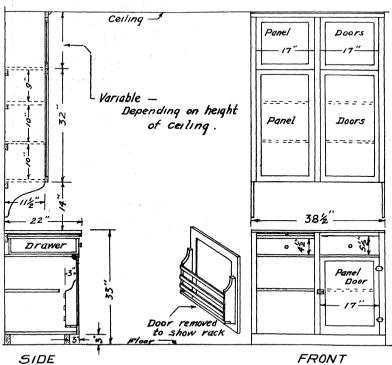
Kitchen cabinet space, showing proper dimensions.
